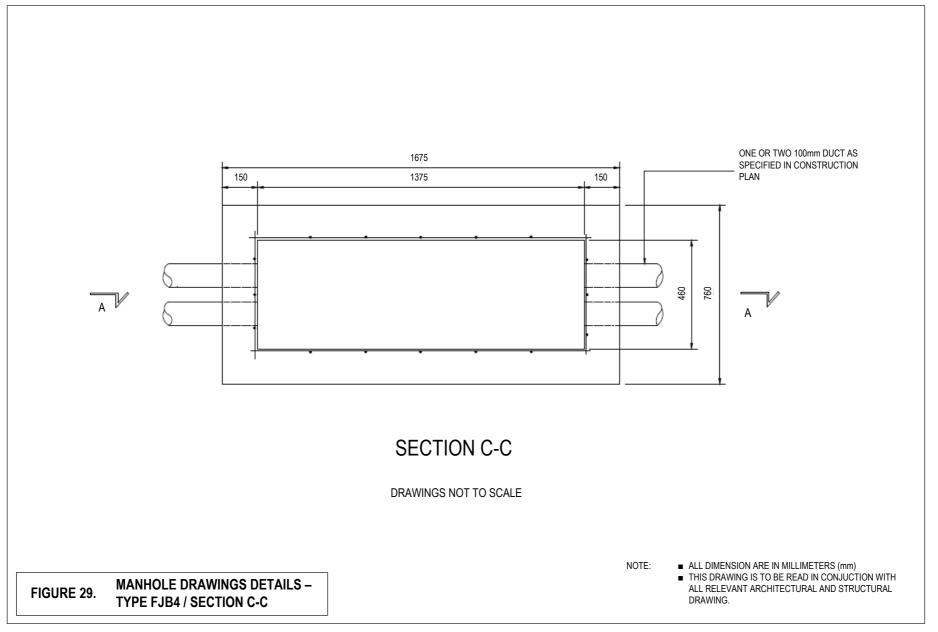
Manhole drawings details - Type FJB4 / section C-C
